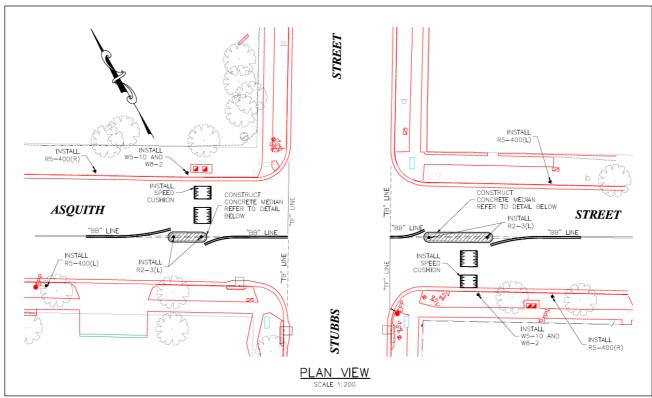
Design plan for the intersection of Asquith Street and Stubbs Street, Silverwater
